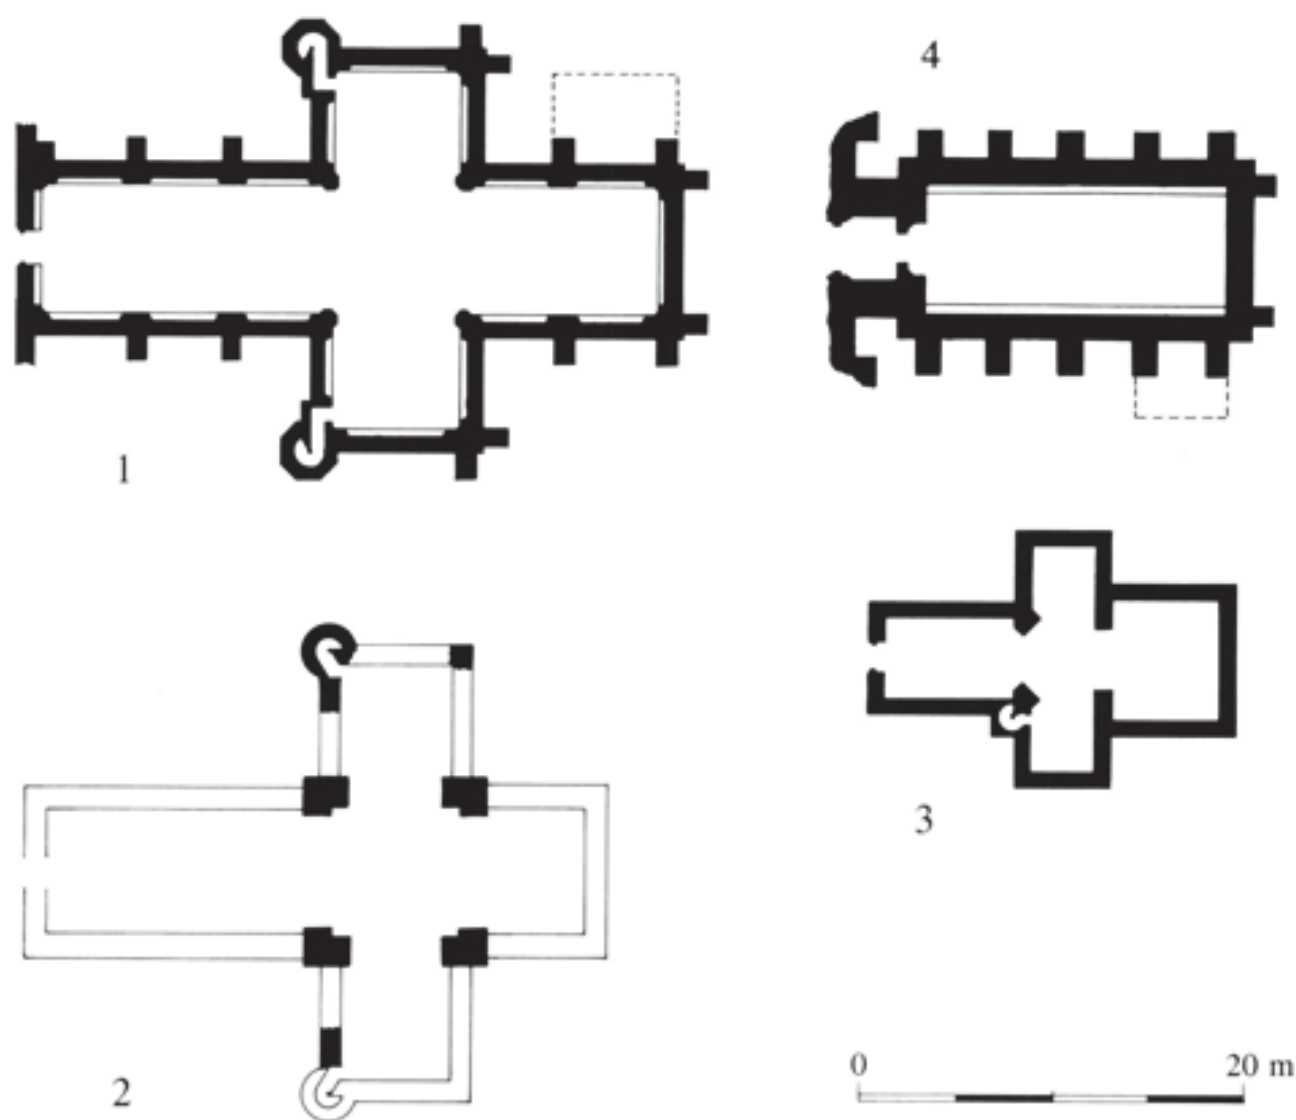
Comparisons between the ground plan of Stillington's chapel and some other buildings. 1 Lady Chapel-by-the-Cloister, Wells; 2 Wimborne Minster; 3 St Mary, Melbury Sampford; 4 Edgar chapel, Glastonbury Abbey. Scale 1:400
